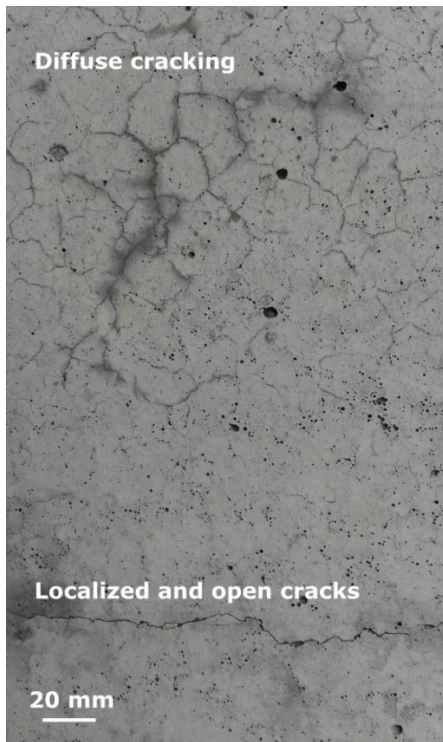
Diffuse and localized cracks on column damaged by expansive phenomena
